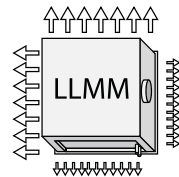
Example of nozzle setting for a single-module unit, LLMM.
